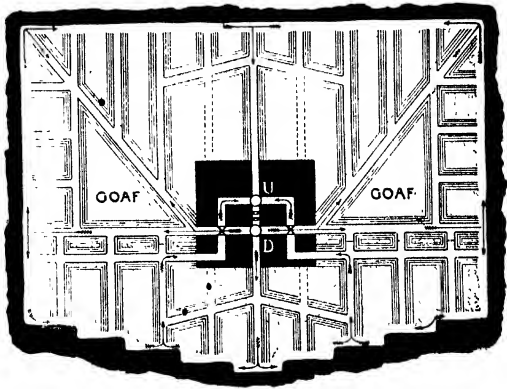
Illustrating Longwall advancing with straight and stepped faces, shaft pillar, and ventilation
